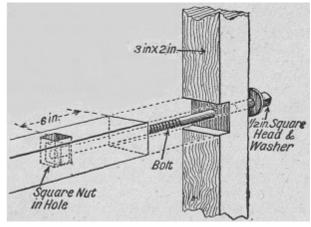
Diagram showing details of a Housing Joint. draw-bolt joint used in framed timber work.
